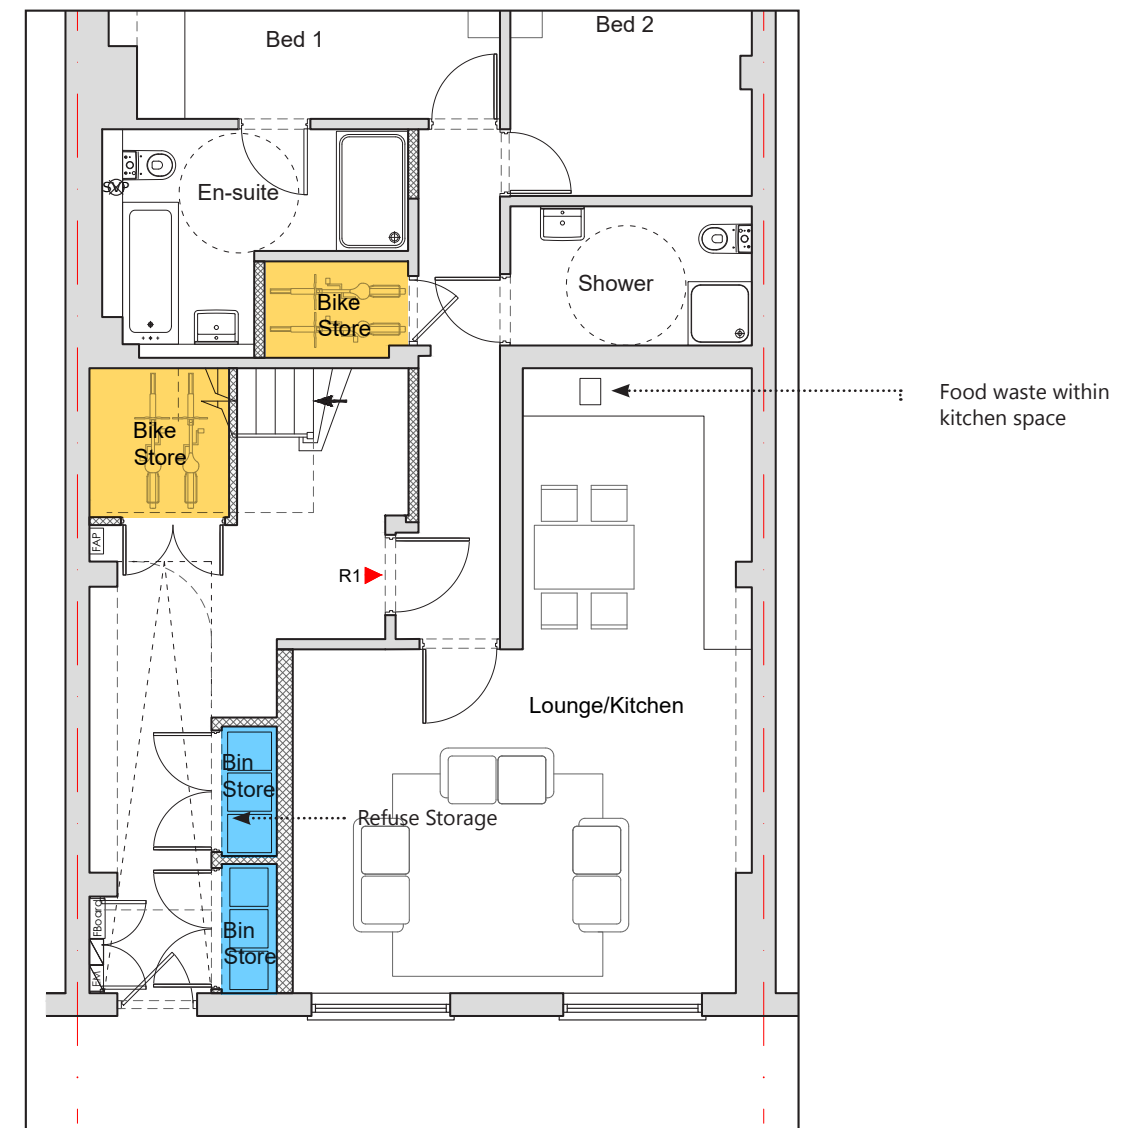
Ground Floor Plan showing location of Refuse Provision and bike stores
